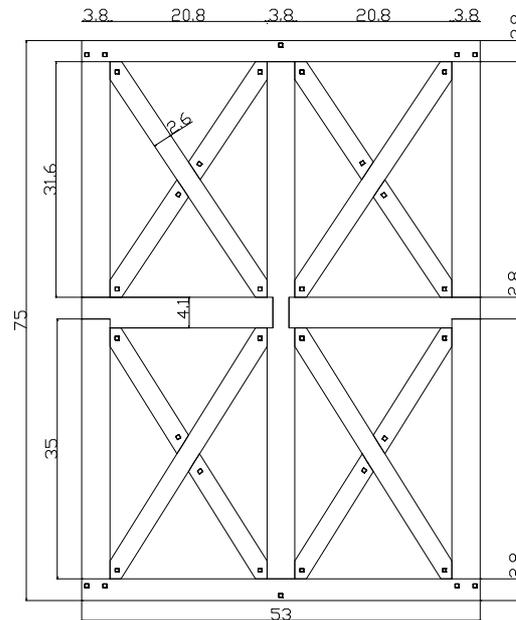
Dimensions of wall panel timber frame elements (cm)
